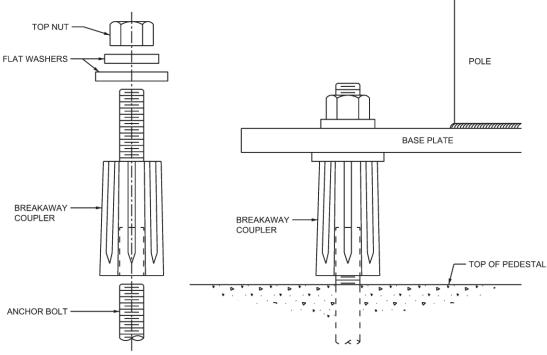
Typical Cast Aluminum Coupler Assembly
